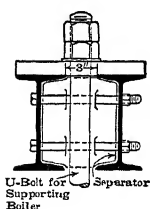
I-Beam Suspension for Horizontal Tubular Boilers
